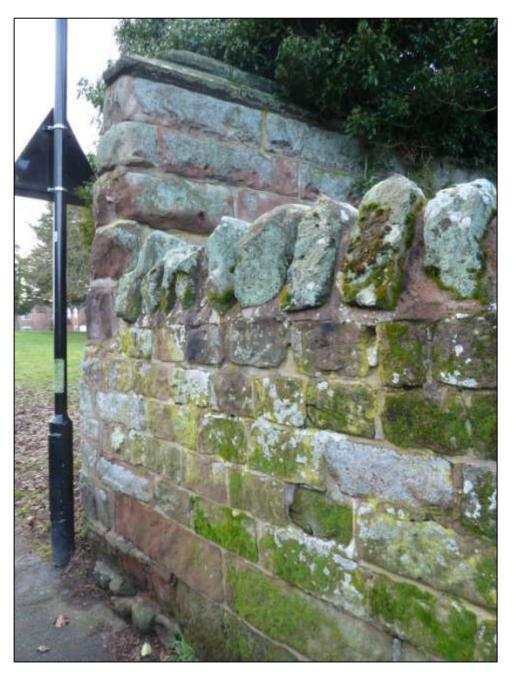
Church boundary wall and truncated boundary wall formerly stretching to Parkside
